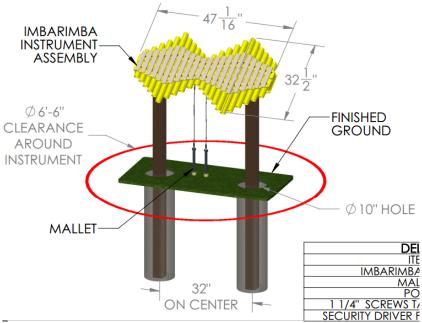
Detail of the Imbarimba installation. Photo from http://freenotesharmonypark.com
